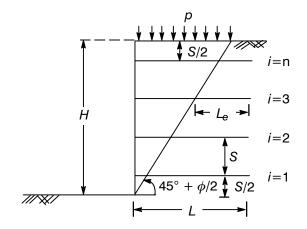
Arrangement of reinforcements in a clay wall model (after Ingold 1981).
